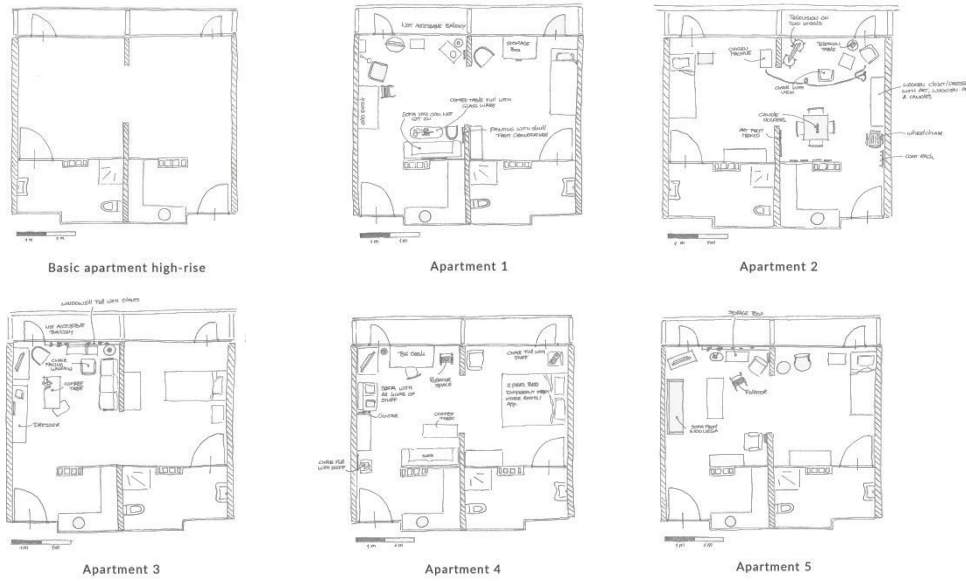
Different interiors of the same floor plan. Source: Different interiors of the same floor plan by Gitta Tolboom
